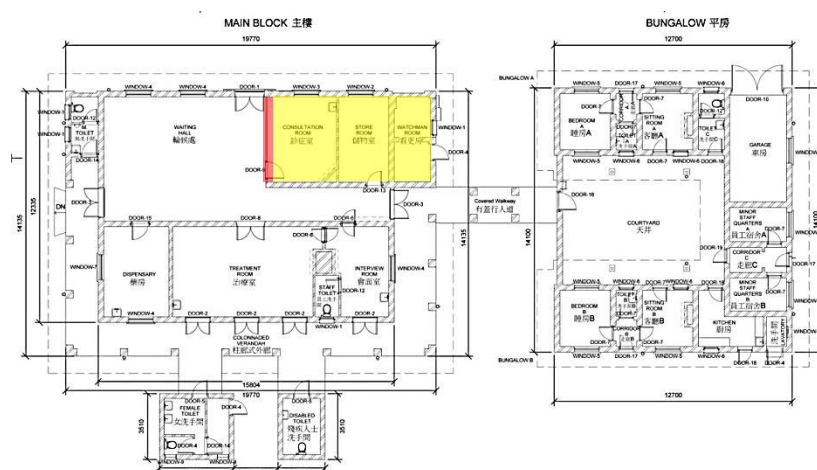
The existing layout plan of Lady Ho Tung Welfare Centre. The part of the later-added fiberboard partition wall is retained *in-situ* (highlighted in red). According to the old memo, the additional 32m² ward should be the area highlighted in yellow. Edited by Hannah Liu
